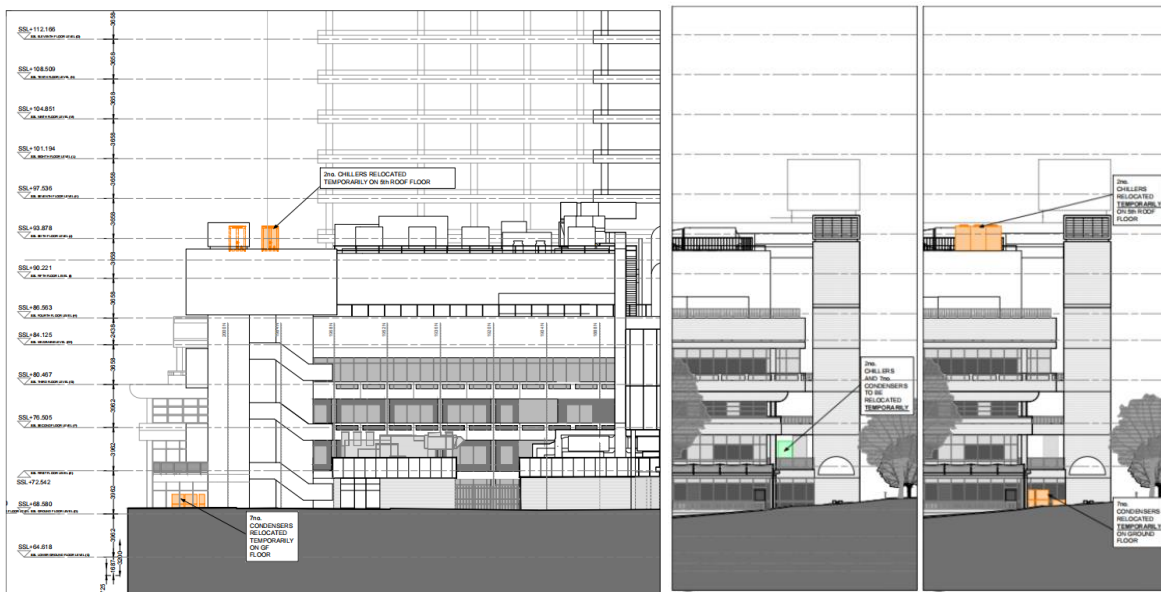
Temporary works (in orange): equipment , relocated temporarily, visible from Pond Street and HAS entrance
